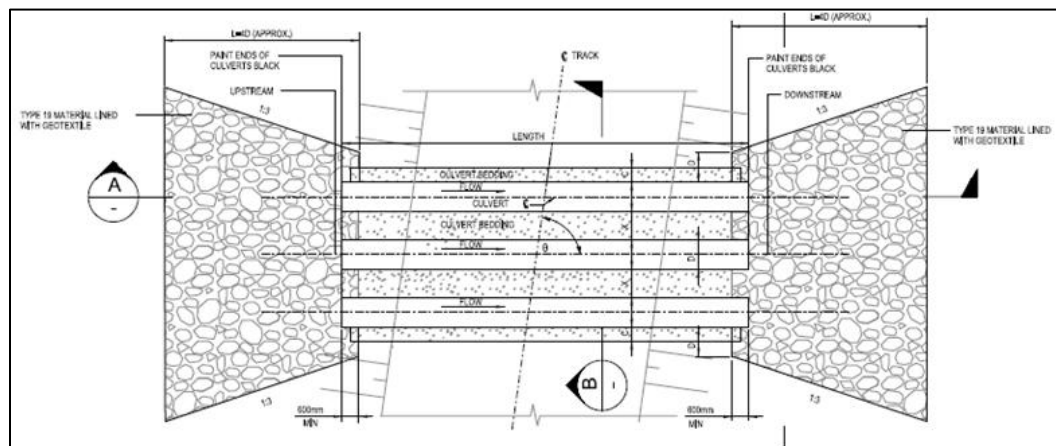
Plan – Multiple Pipe Culvert with Erosion Protection
